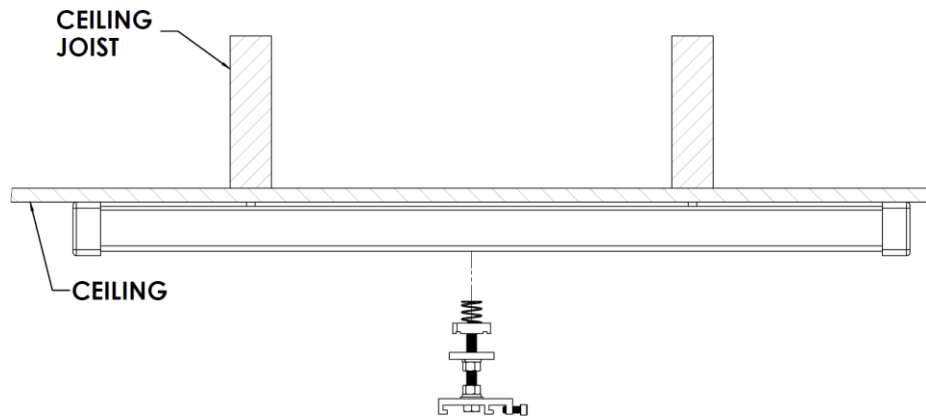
Attach the Assembled Track Bracket Assemblies to the Strut
